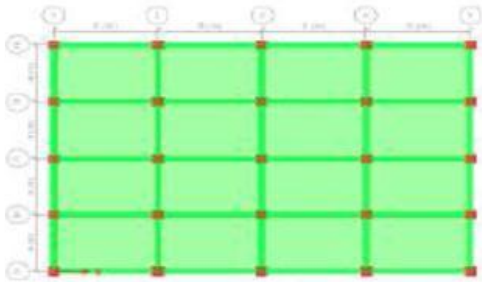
structural model of G+6 storey building in ETAB(plan view)
